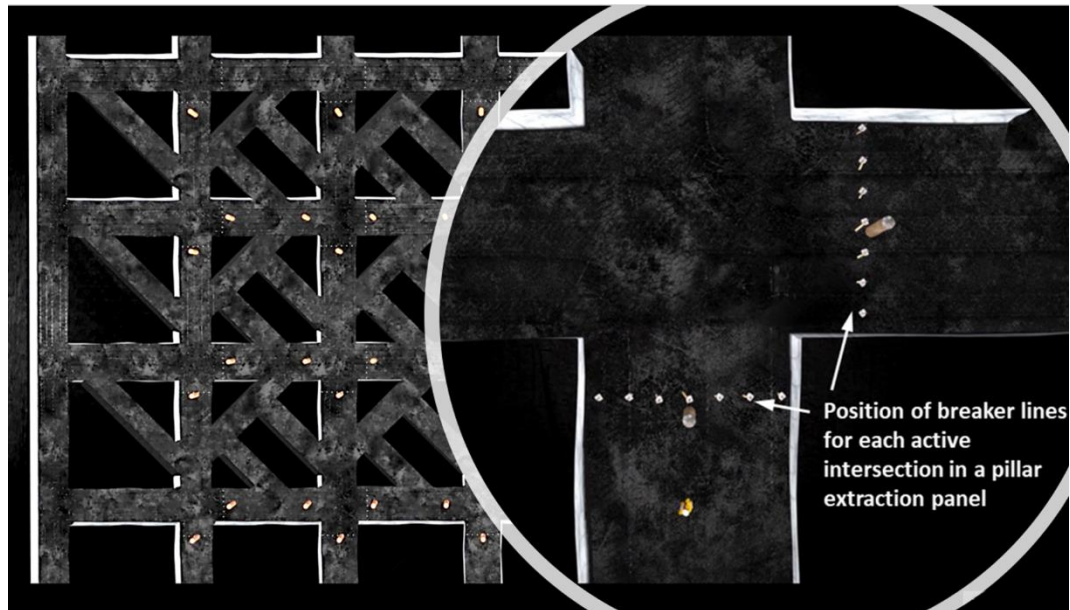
Positioning of breaker lines in each active intersection in a pillar extraction panel. Roof bolts are installed as breaker lines between the pillar corners (Sasol Mining, n.d.).
